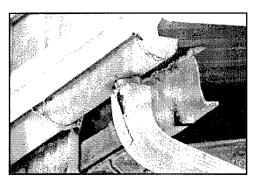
Original half-round gutters shall be maintained; the nonoriginal downspouts should be replaced with original style when they have deteriorated.
